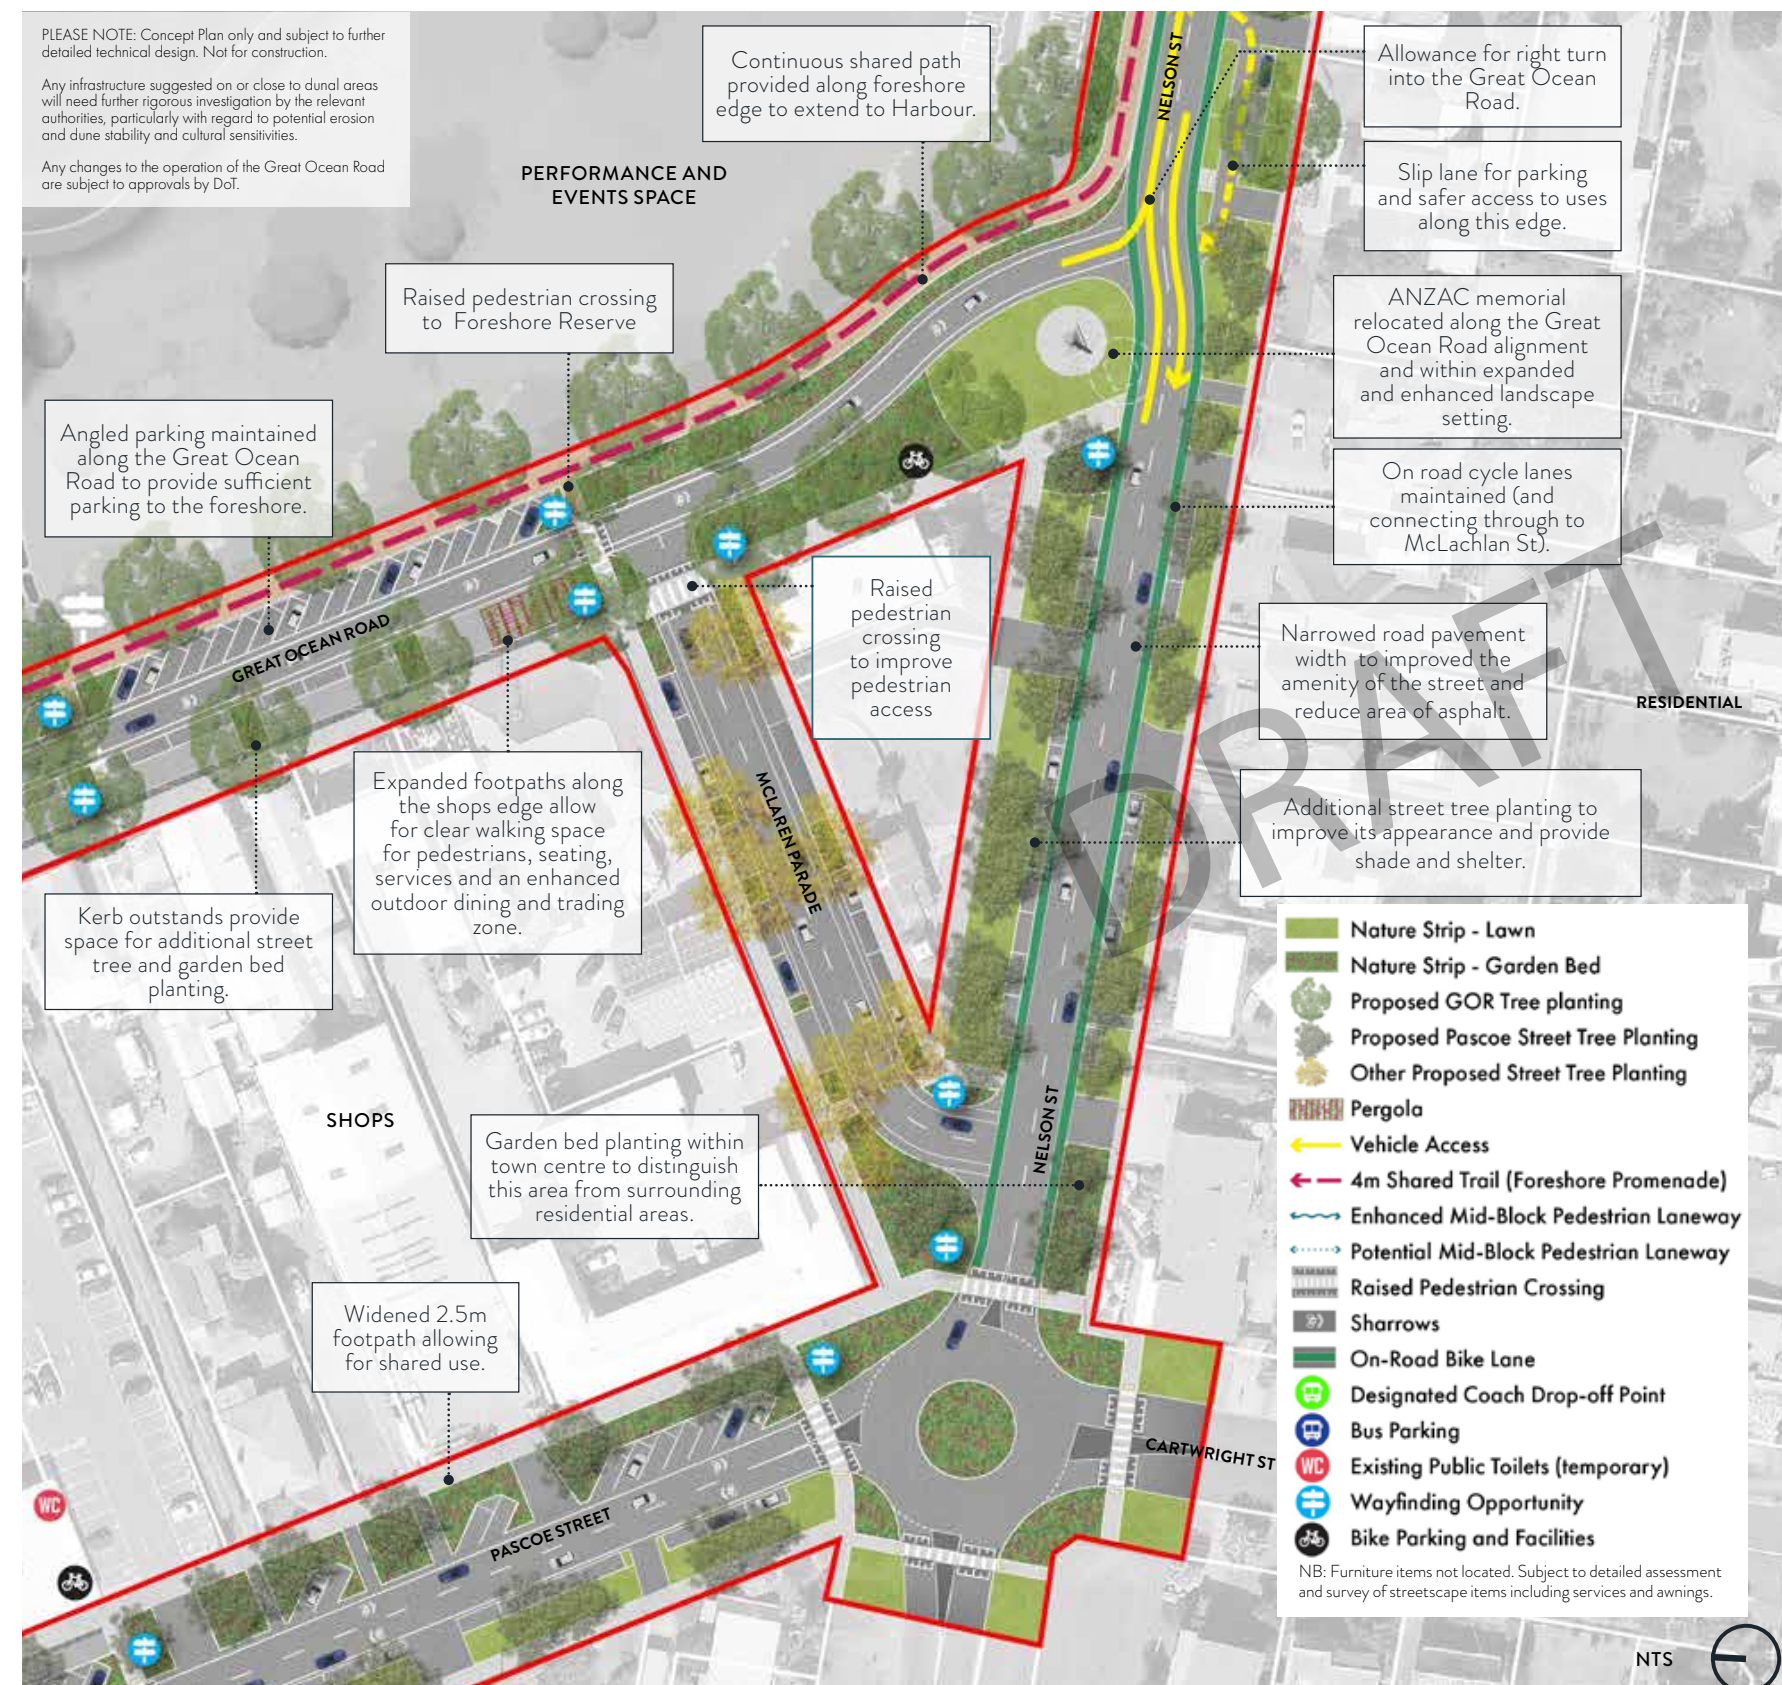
Detailed Streetscape Plan 3 - Option 1 - One-Way
